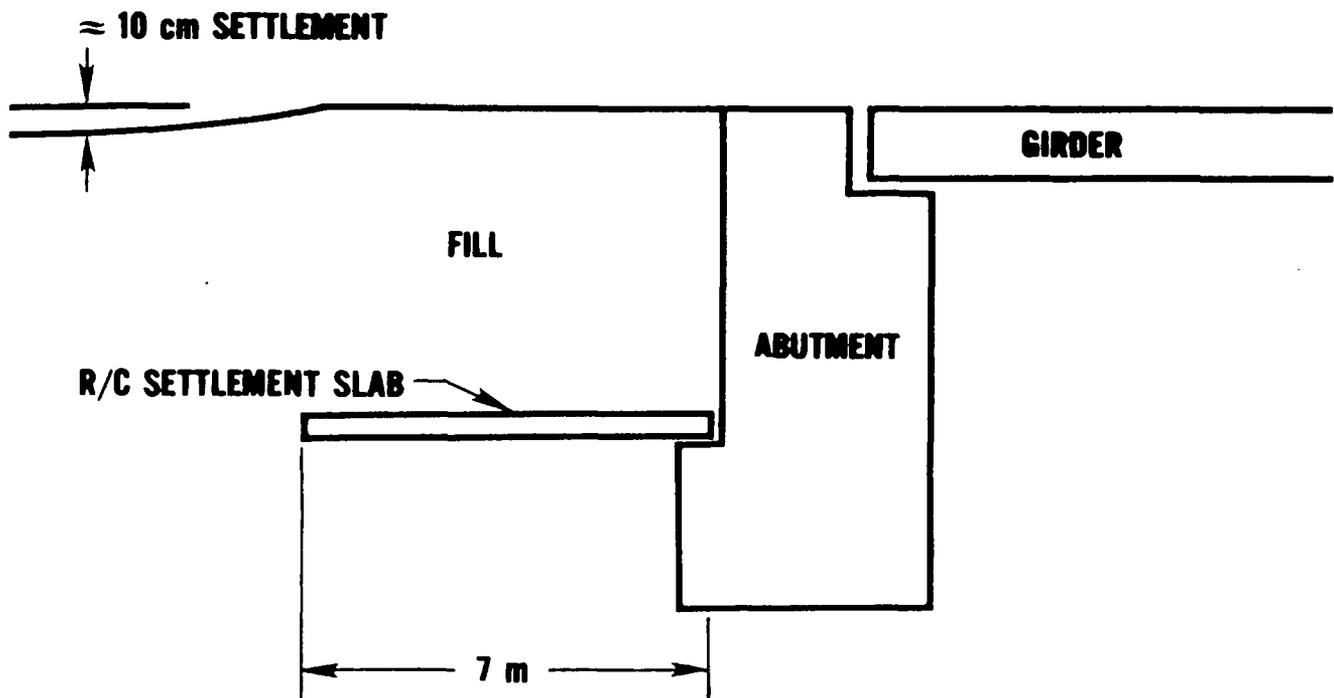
Detail of Reinforced Concrete Approach Settlement Slabs.
